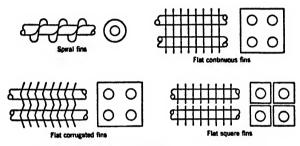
TYPES OF FIN COIL ARRANGEMENT
